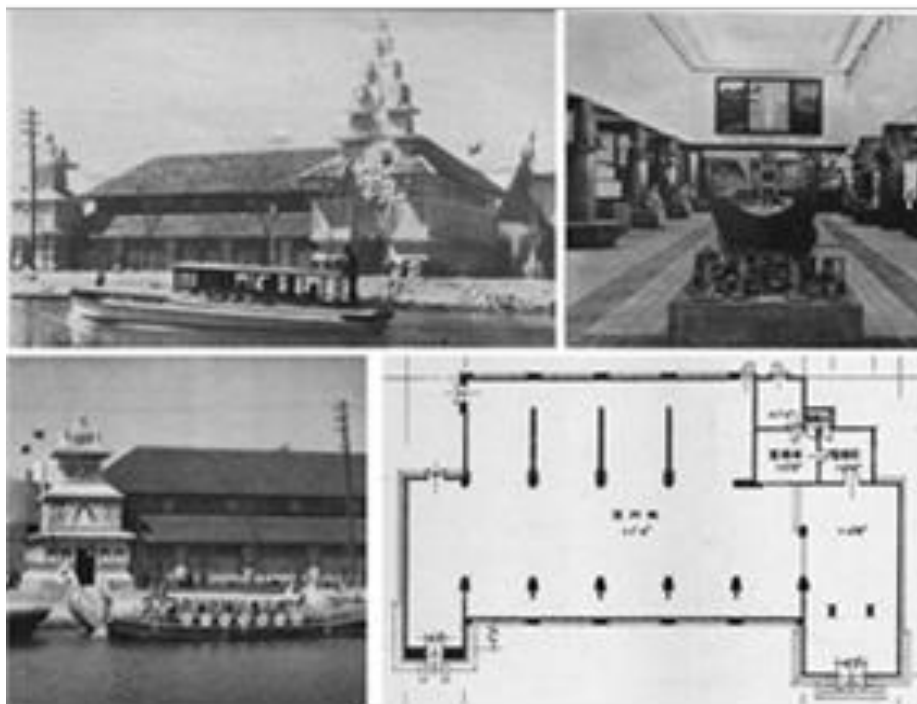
1937 Pavilion photos and plan (source: D' Orient, No.21/ May 22, 1937)
